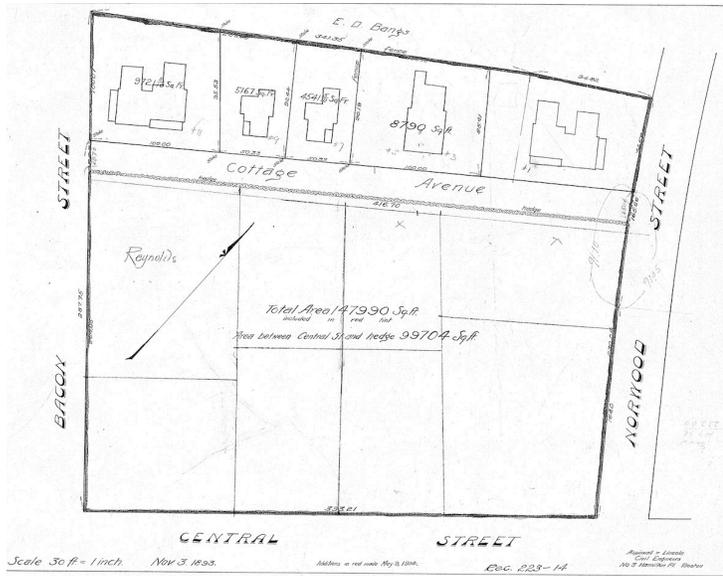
1893 Subdivision plan of Greenhouse lot. Winchester Engineering Department Plot Plan #2135 (November 3, 1893).
